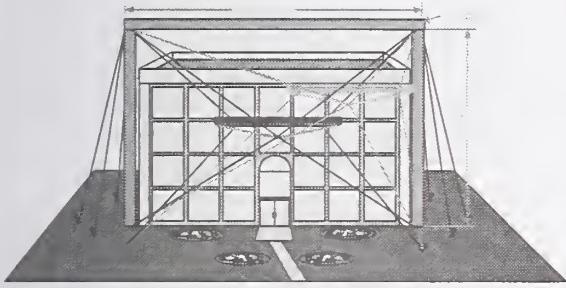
Graphic of a model Flying Carpet applied to external building surface access.
